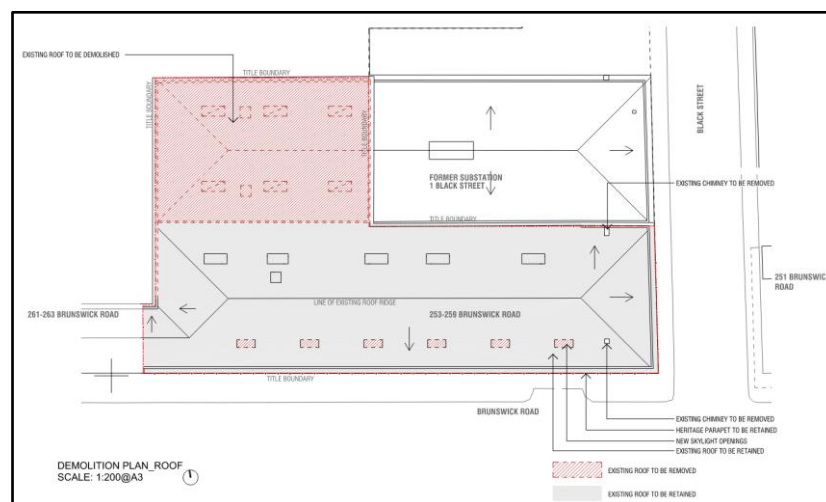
Proposed demolition plan at roof level - extract from 2732_Brunswick Road_Town Planning Package
